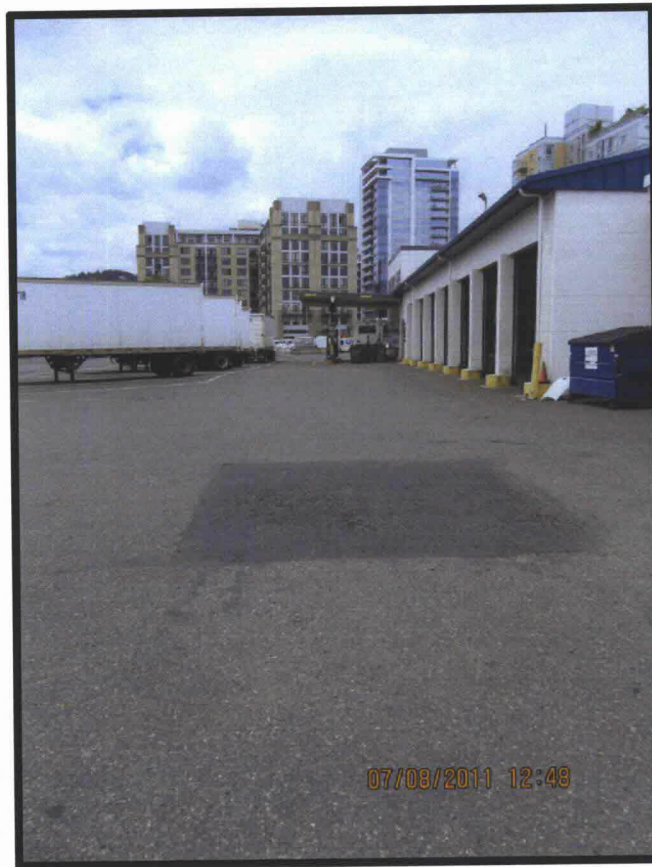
Looking westerly at pavement repair and drive lane south of VMF.
